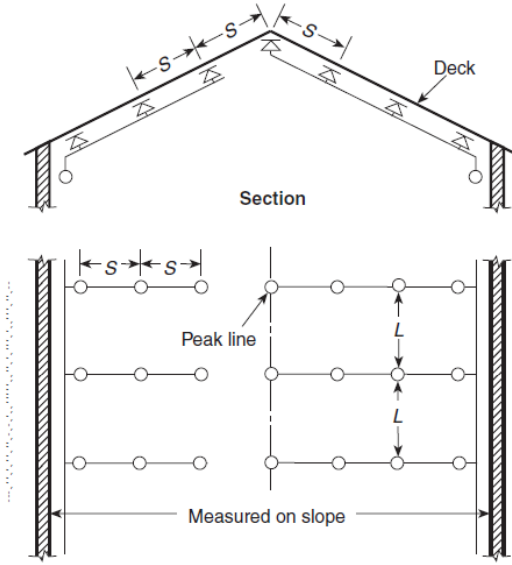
(a) Sprinklers Under Pitched Roof with Sprinkler Directly Under Peak; Branch Lines Run Up Slopes.
